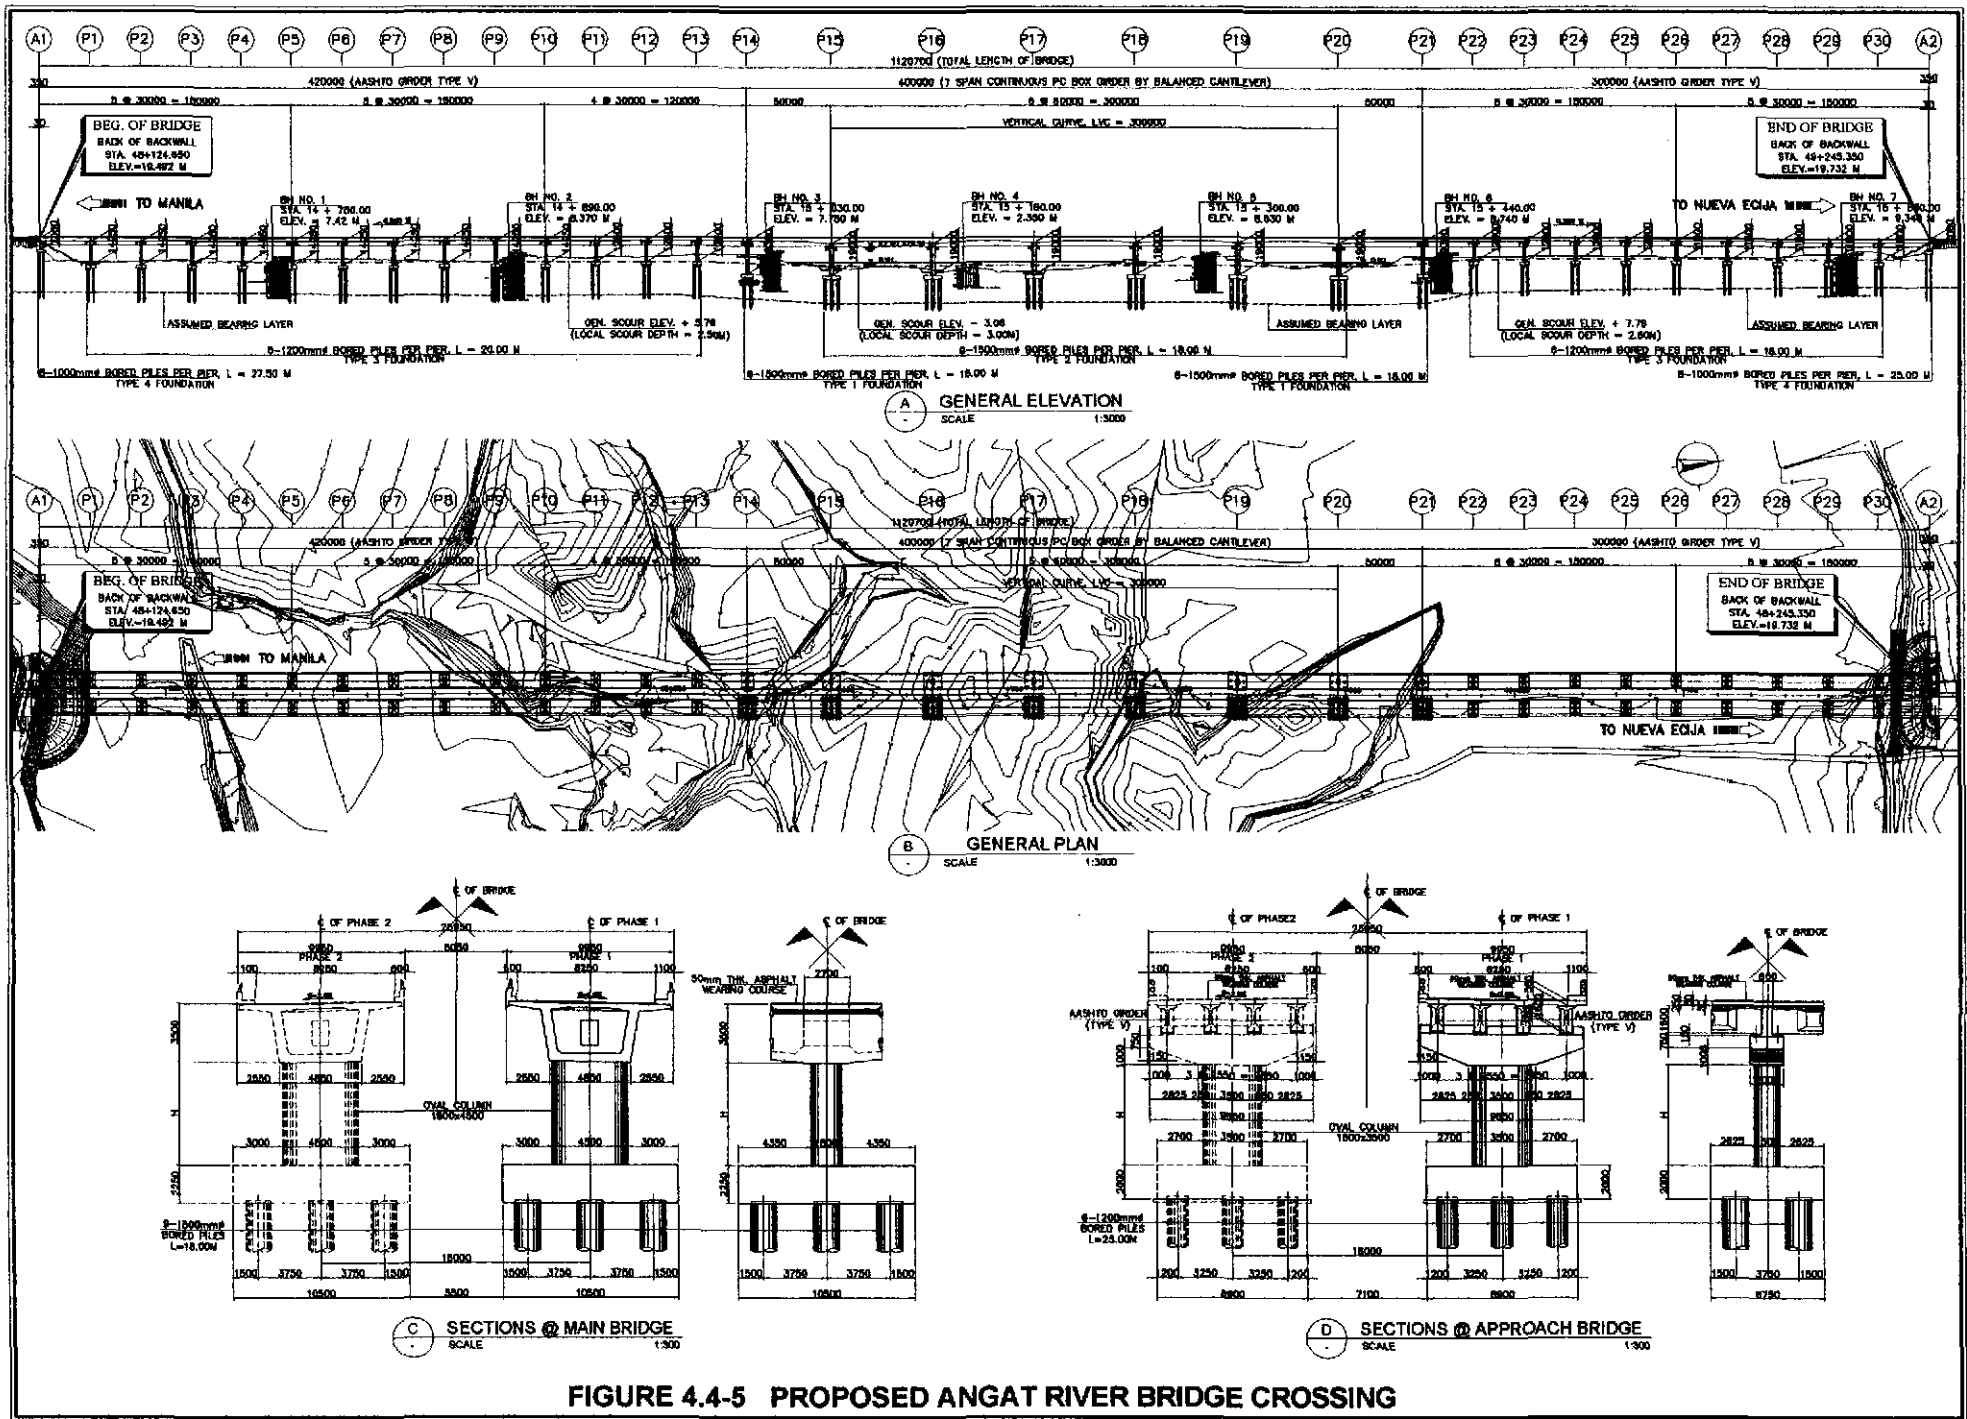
PROPOSED ANGAT RIVER BRIDGE CROSSING
